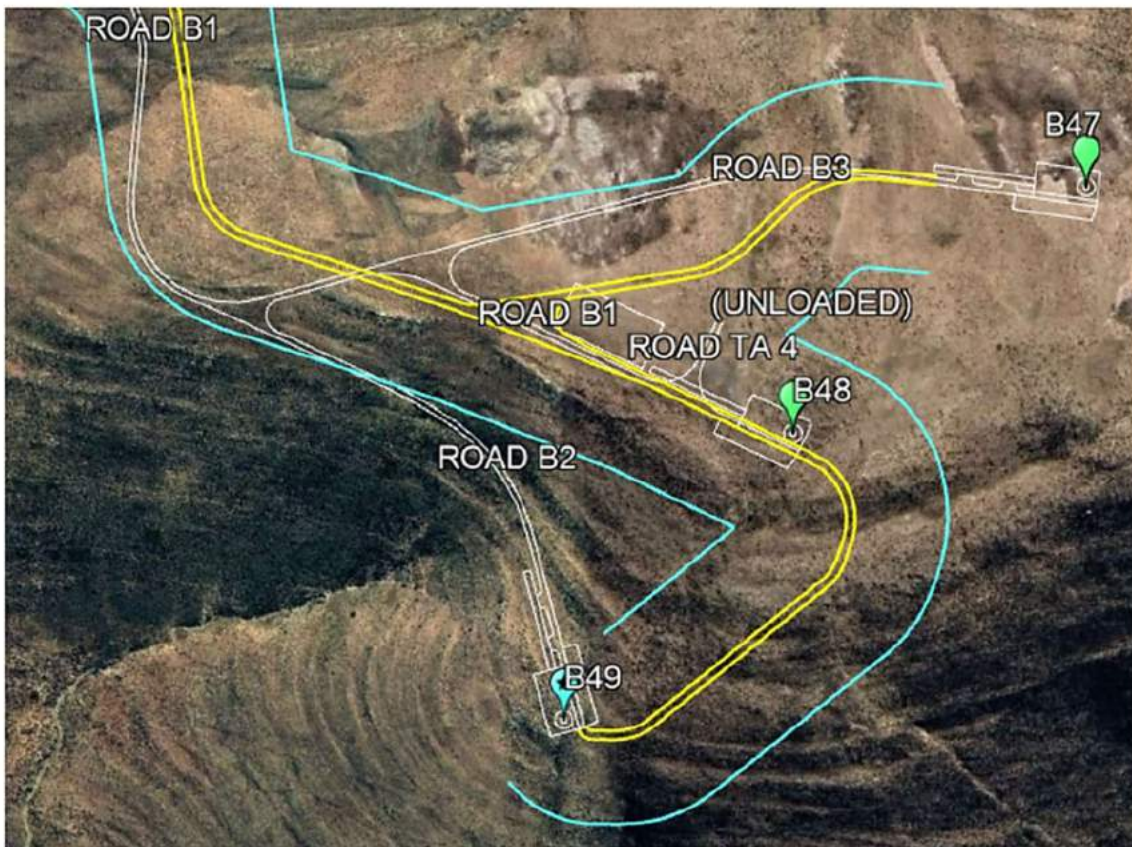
2: Plan showing horizontal re-alignment of Road B2 (Yellow – approved layout, White - proposed deviation blue the approved 200m road corridor DEA reference 14/12/16/3/3/2/900– dated 23 November 2016). Note new alignment (white) follows contour of mountain.
